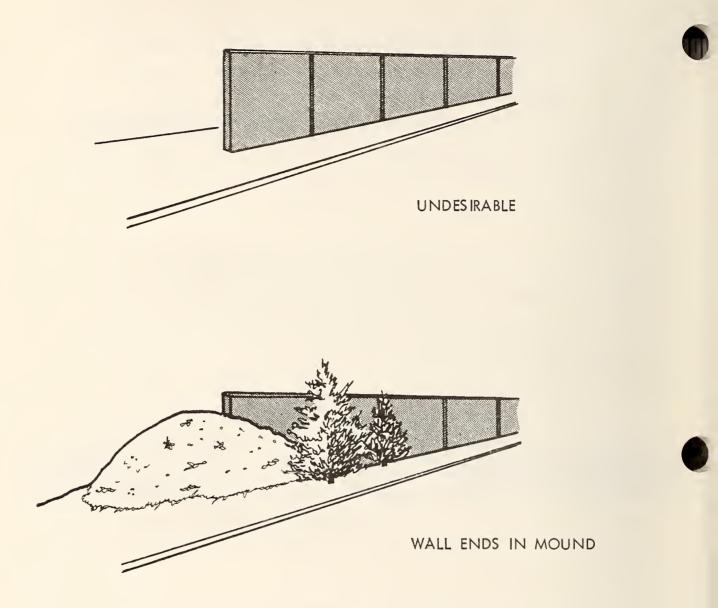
USE OF EARTH MOUND TO TERMINATE WALL
